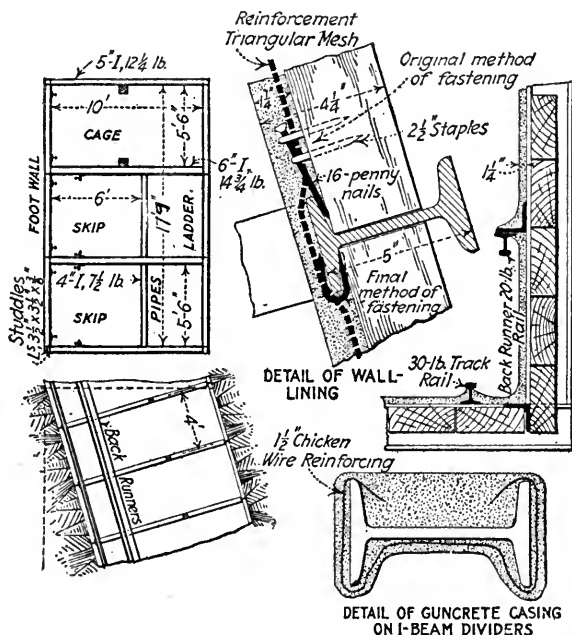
SHAFT ARRANGEMENT AND DETAILS OF COATED MEMBERS.
